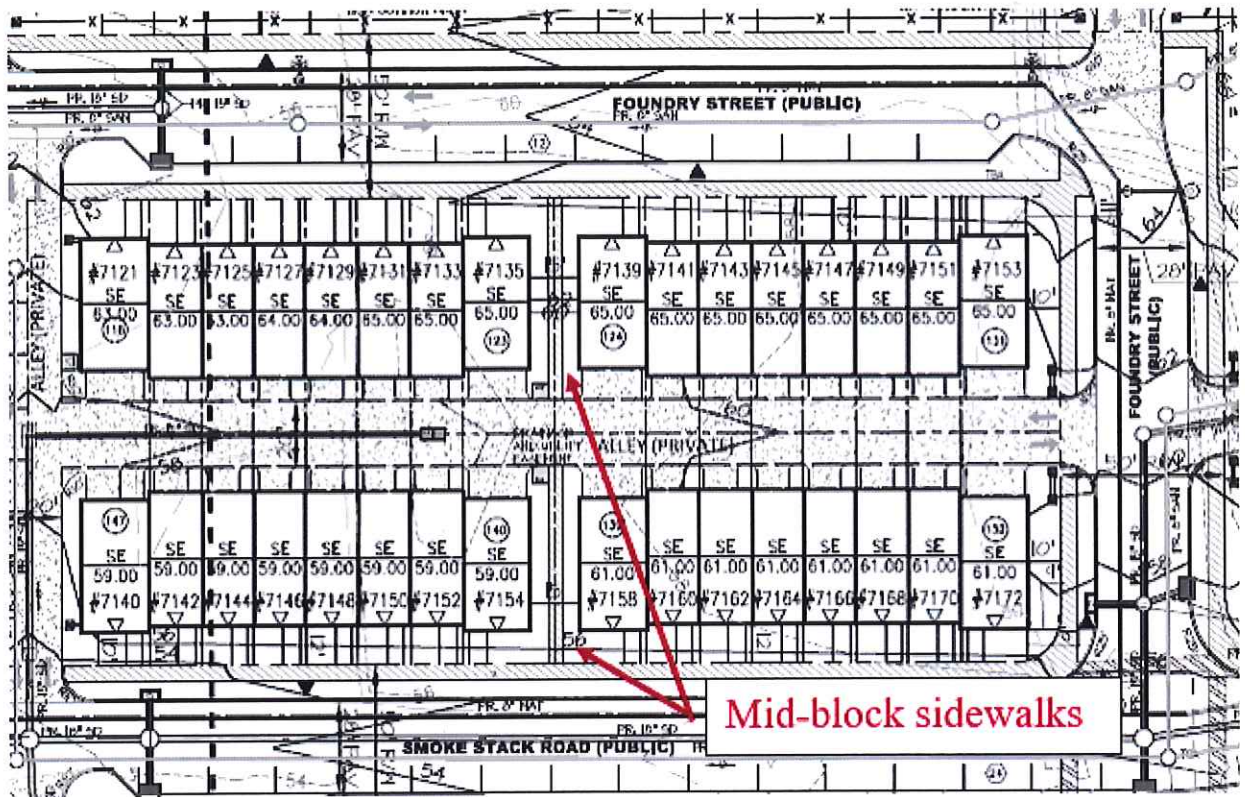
Example of mid-block sidewalk passages within a townhouse grid layout.
